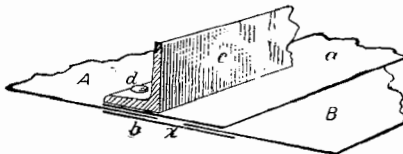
Expansion Slip Joints for Heavy Metal Ducts
